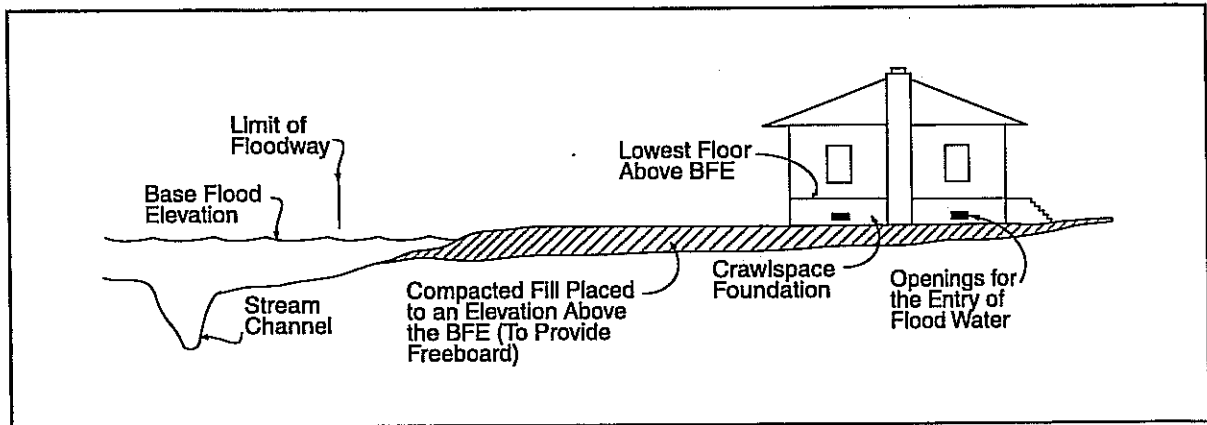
Structure on a crawlspace foundation. The lowest floor is raised above the BFE. Openings in the foundation walls allow water from floods higher than the fill elevation to enter the crawlspace and equalize the pressure on foundation walls.
